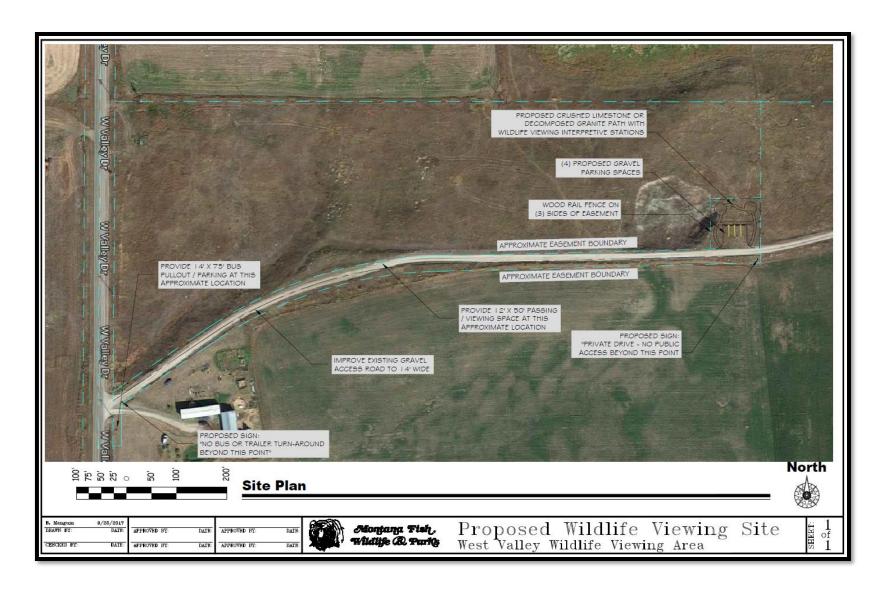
Preliminary plan for the proposed wildlife viewing area.
